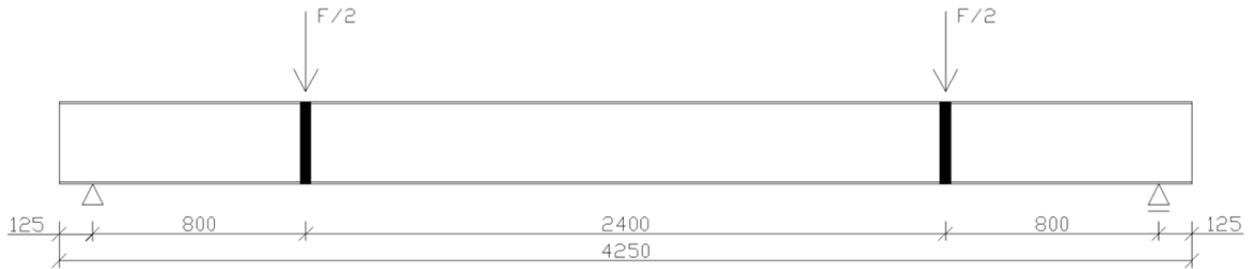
Four-point bending test set-up of hybrid steel-glass beams with SikaFast-5211 NT.
